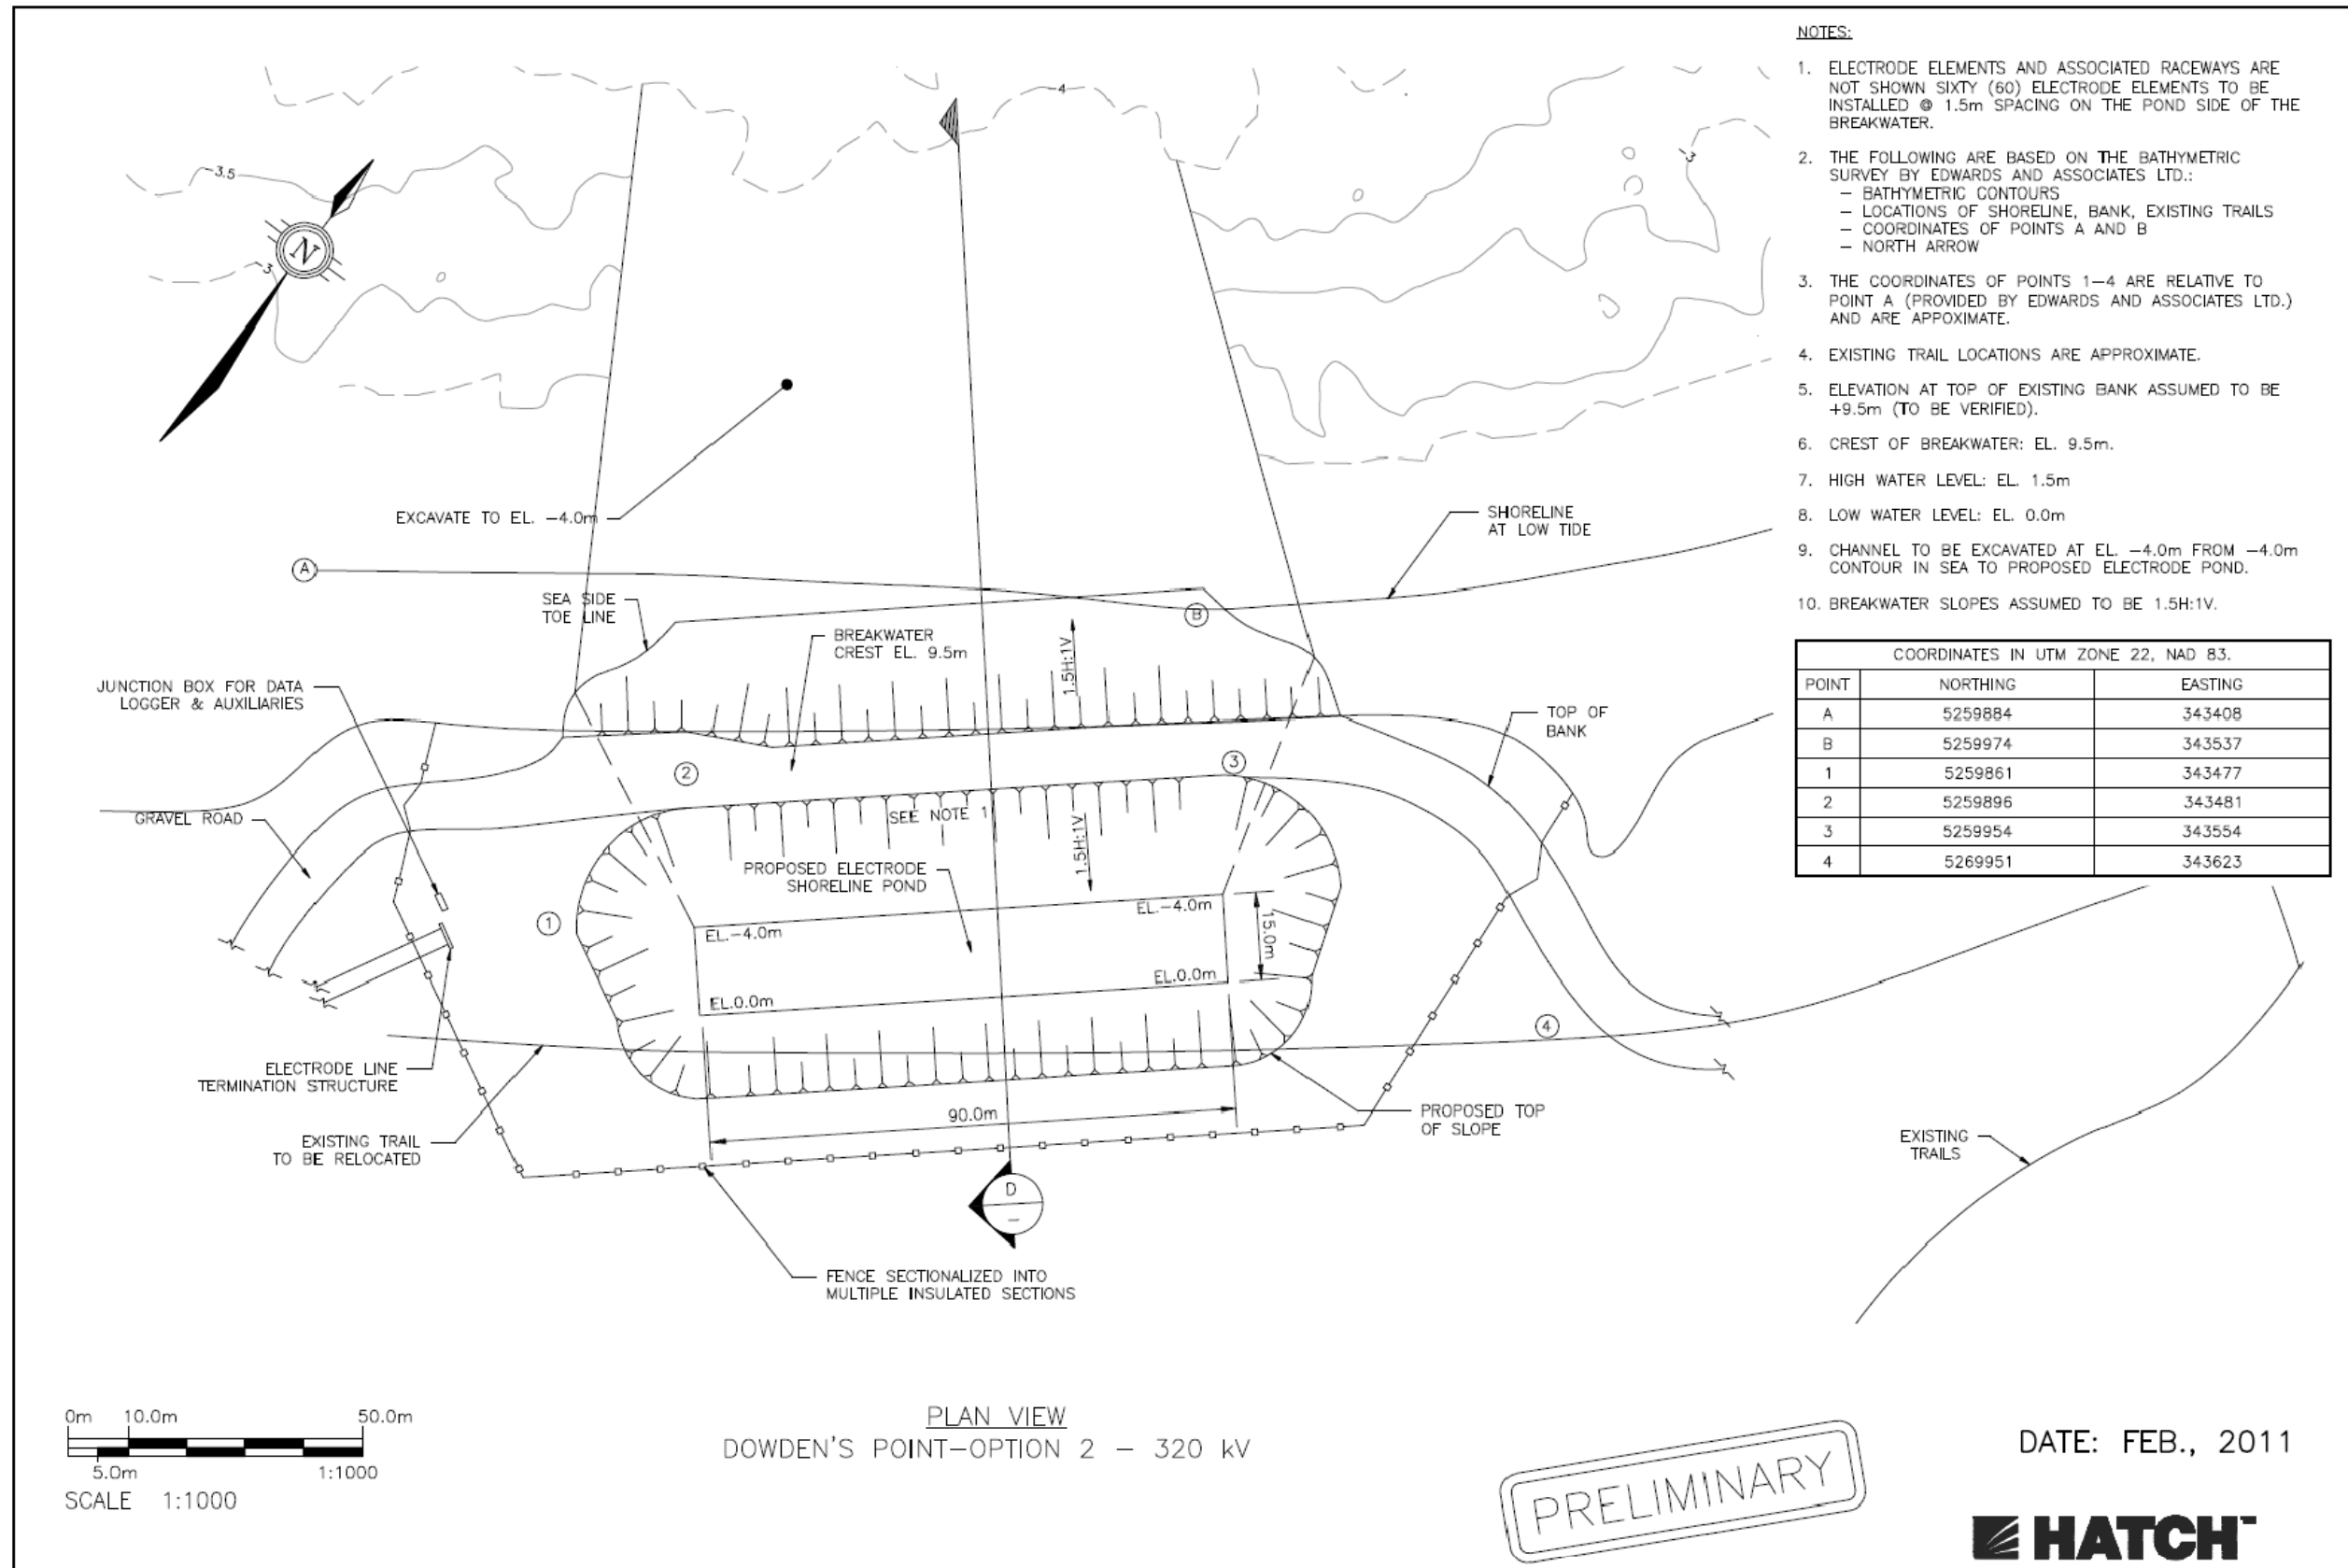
Dowden's Point Shoreline Pond and Breakwater Plan – Option 2, 320 kV Scenario
